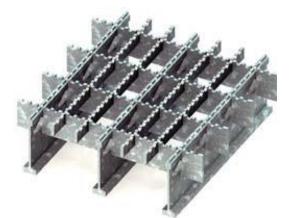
Open Steel Grid Deck (courtesy of BGFMA (11)).
